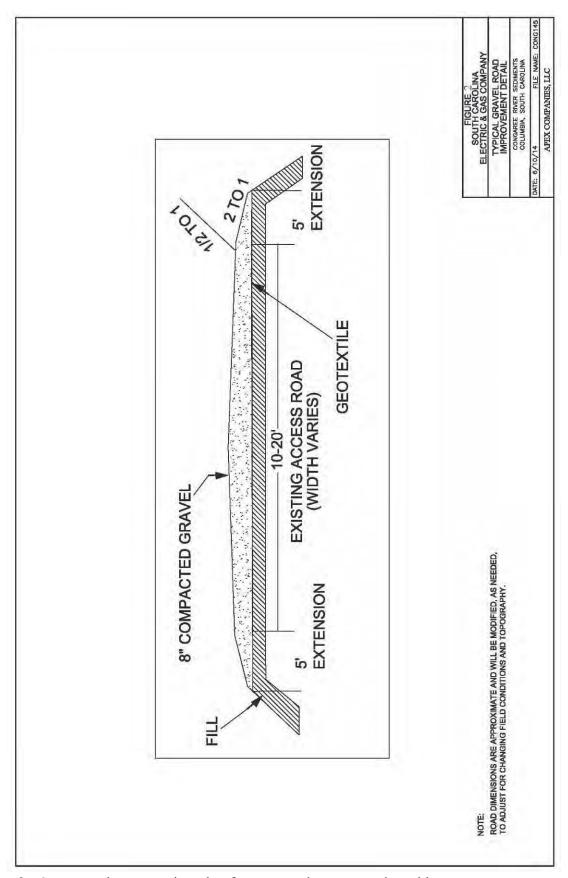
Conceptual construction plan for proposed access roads and improvements.
